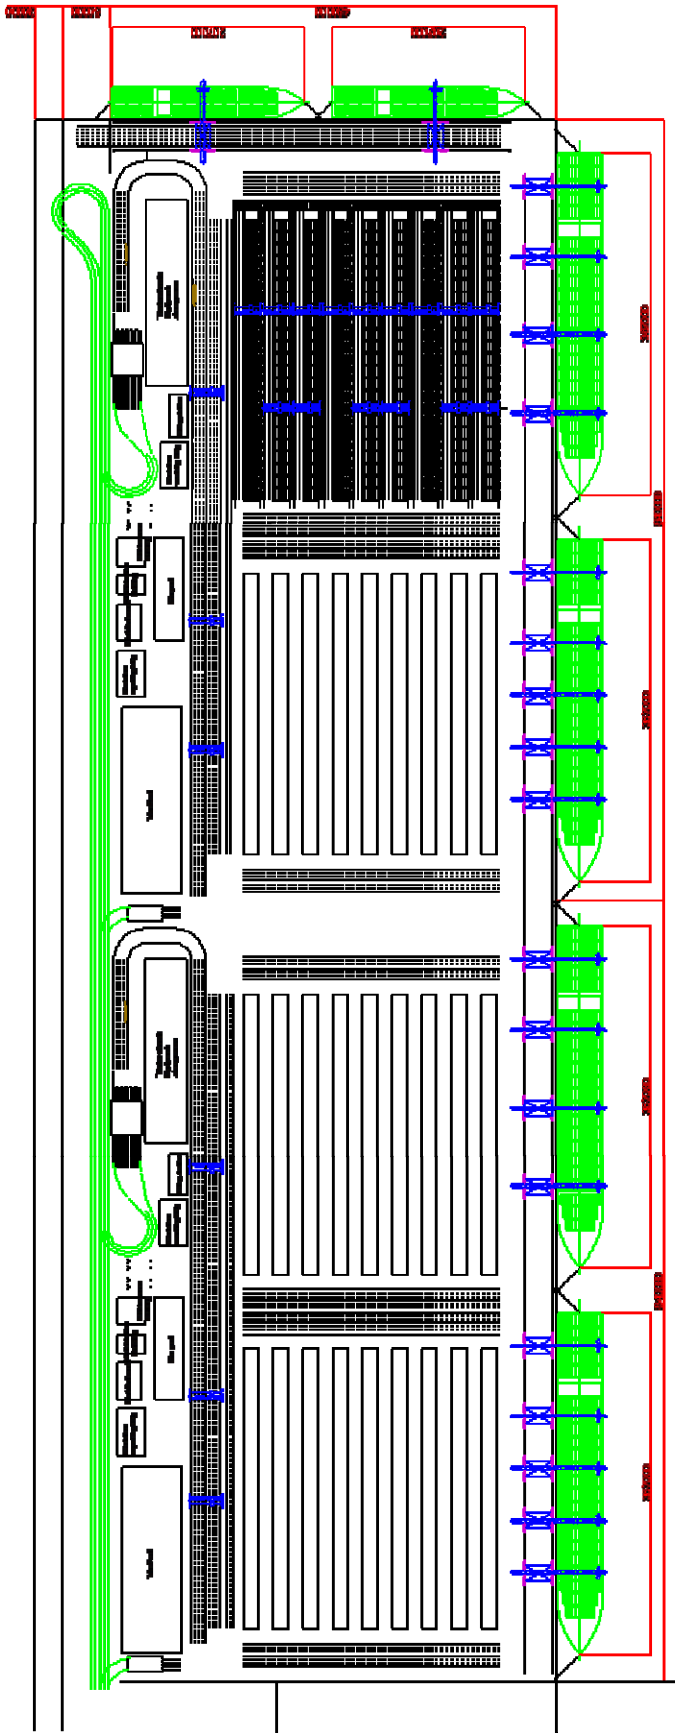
Layout drawing of Automated horizontal container terminal
